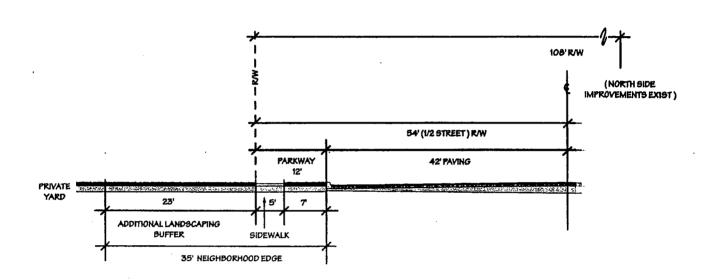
, "West Haven Collector Street (Turner Avenue and Chino Avenue)" illustrates the Chino Avenue (Full Street) proposed improvements.
